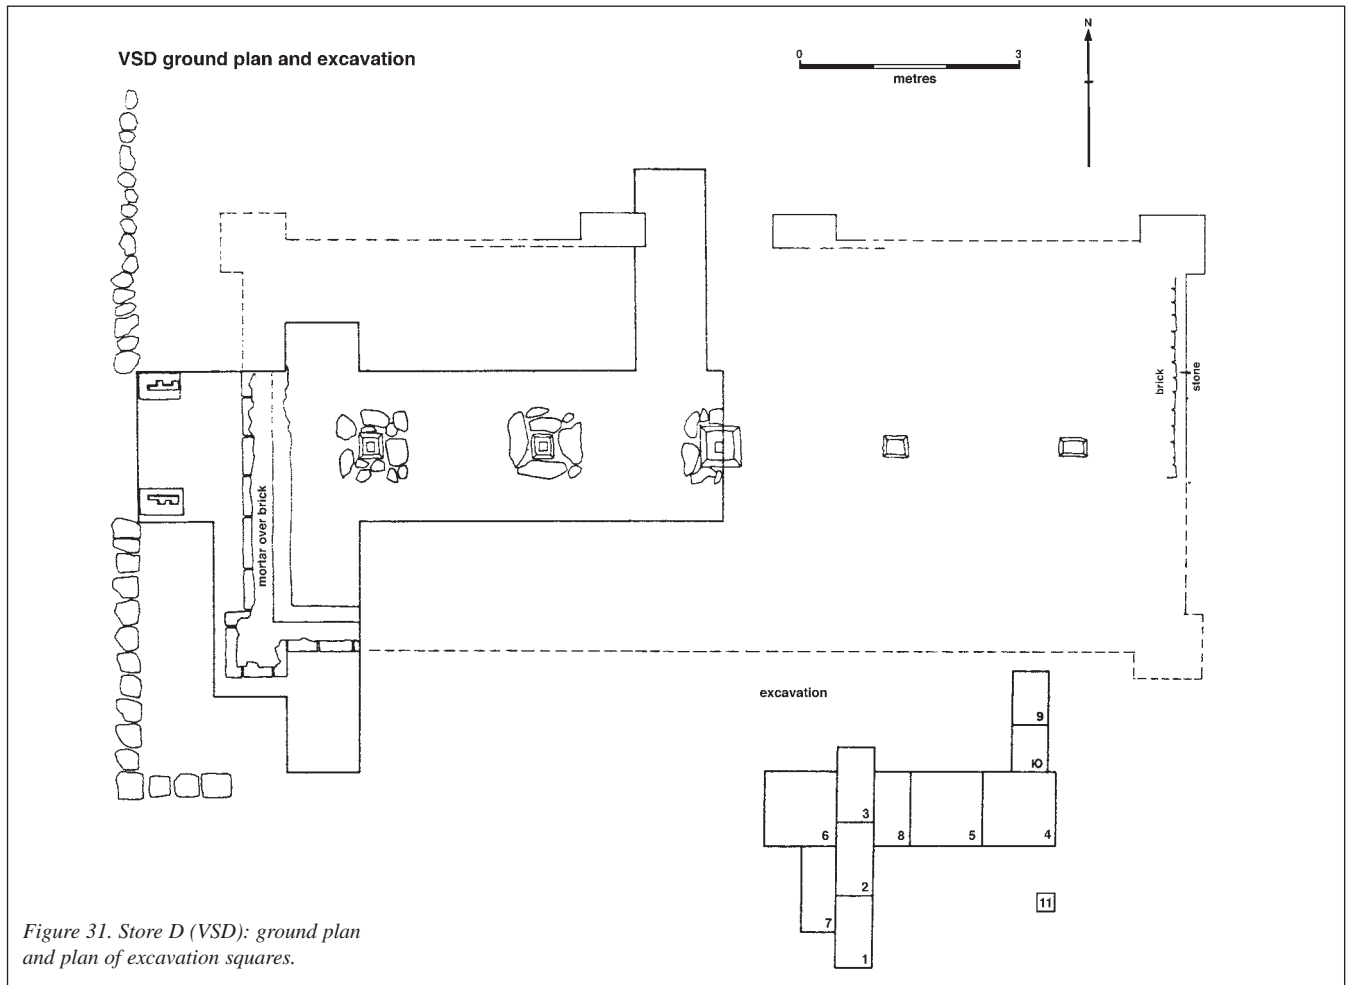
Store D (VSD): ground plan and plan of excavation squares.
